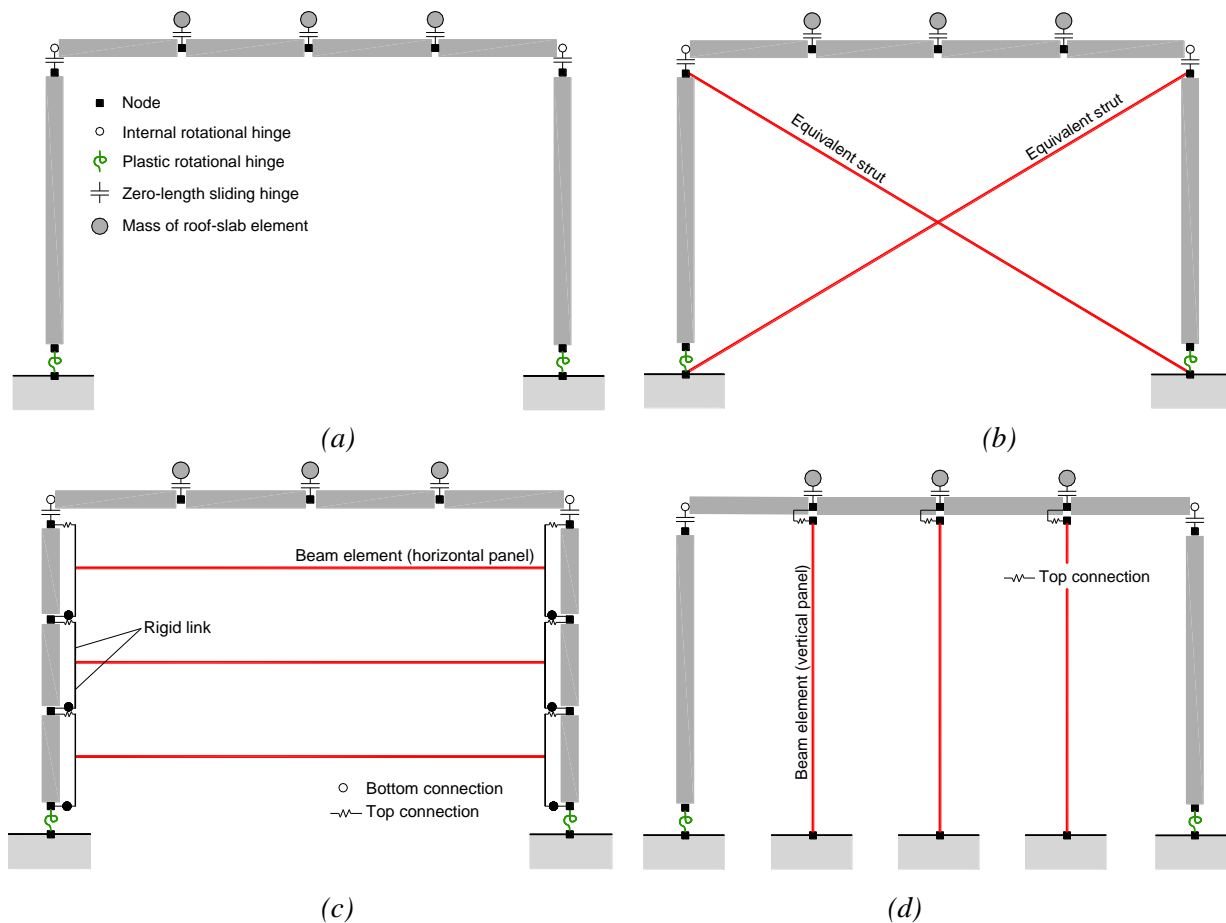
FE modelling of the different frame typologies: (a) Internal frame; Perimeter frame with (b) masonry infill walls, (c) horizontal cladding panels and (d) vertical cladding panels.
